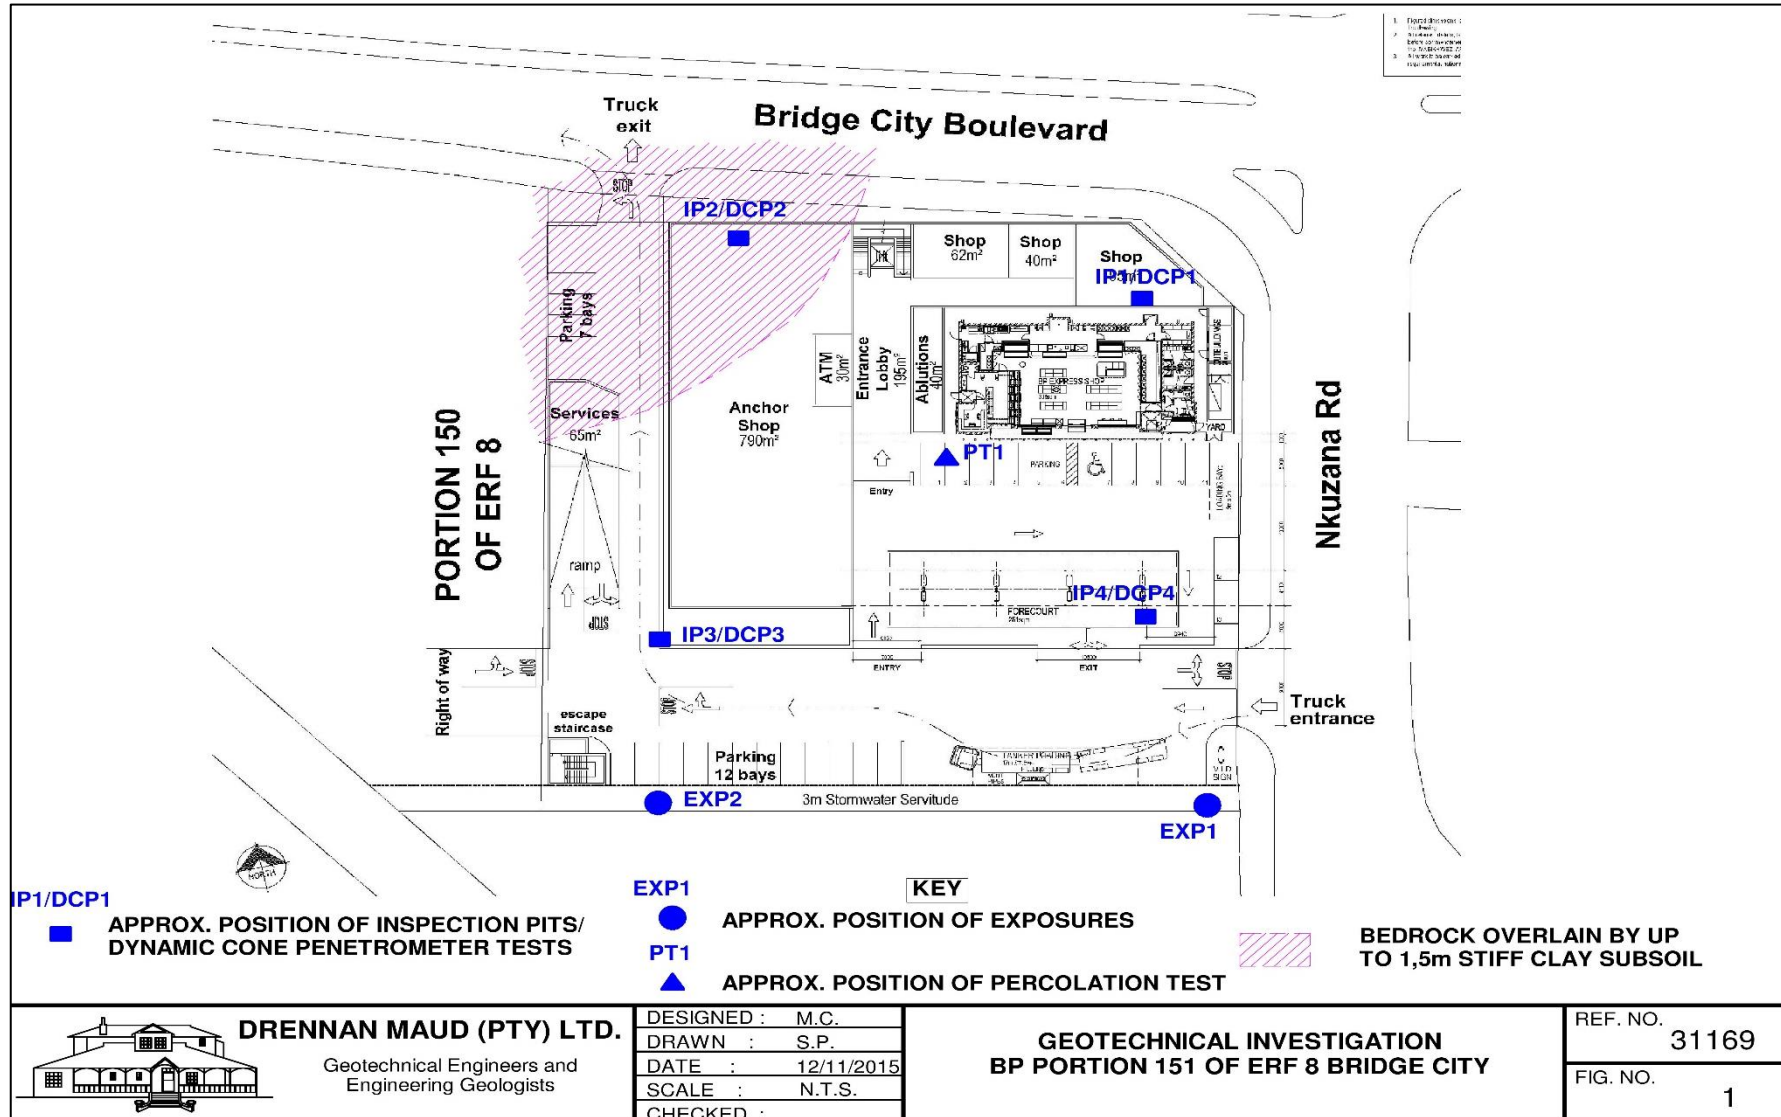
Showing the site layout plan for the proposed BP Service Station.
